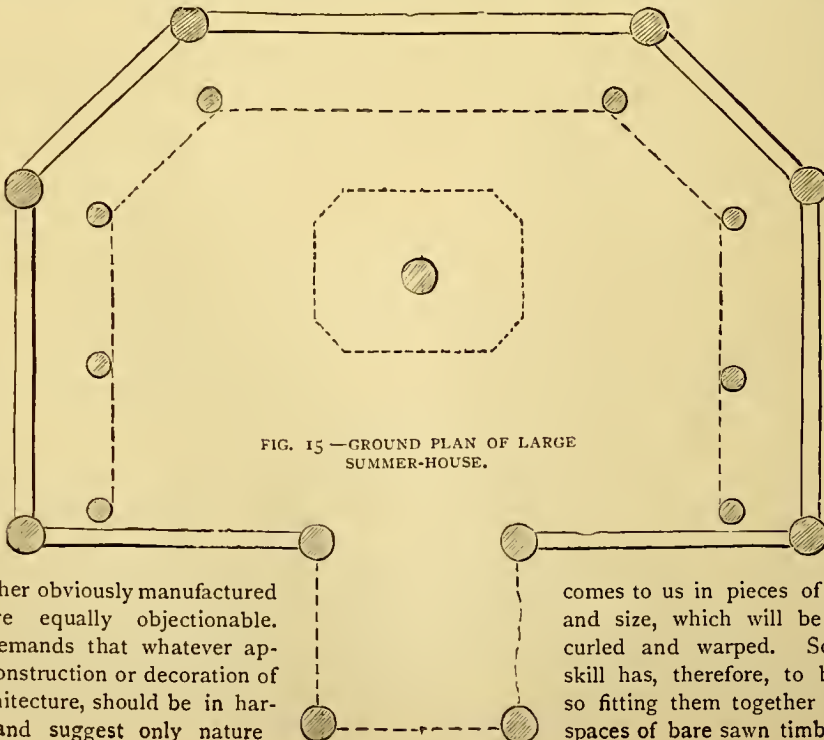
GROUND PLAN OF LARGE SUMMER-HOUSE.
